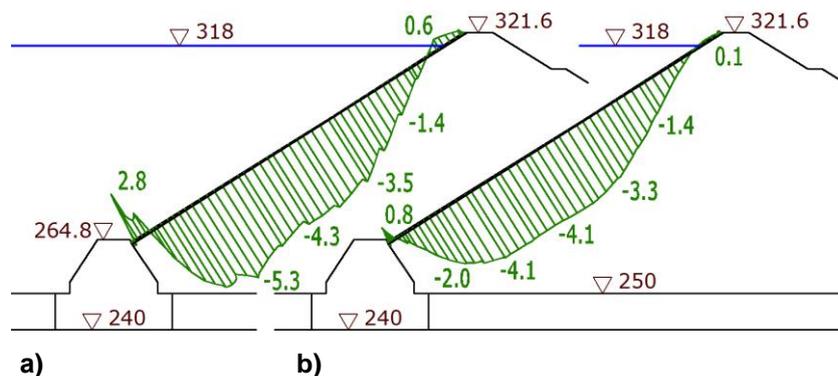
Longitudinal stresses in reinforced concrete face (MPa) in Alternative 1 a – on the upstream face, b – on the downstream face
